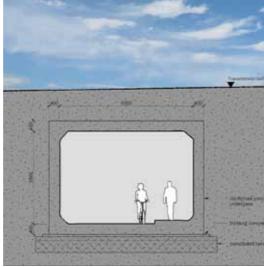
Bridge 7: BHFFP underpass cross-section
